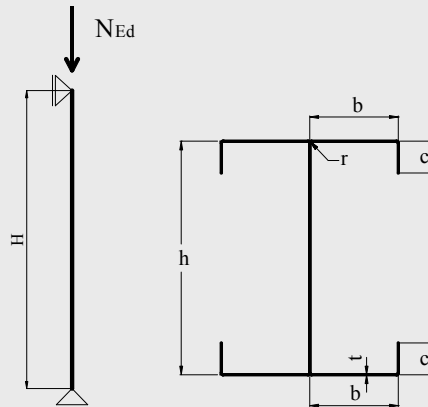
Overall dimensions of internal wall stud and cross section
